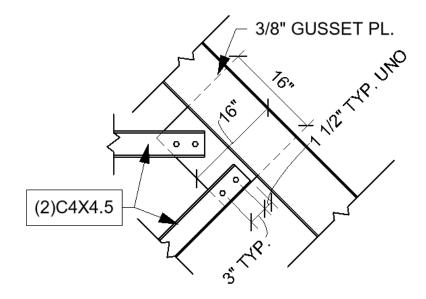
Detail B – Intermediate Bracing Members to Main Brace Connection
